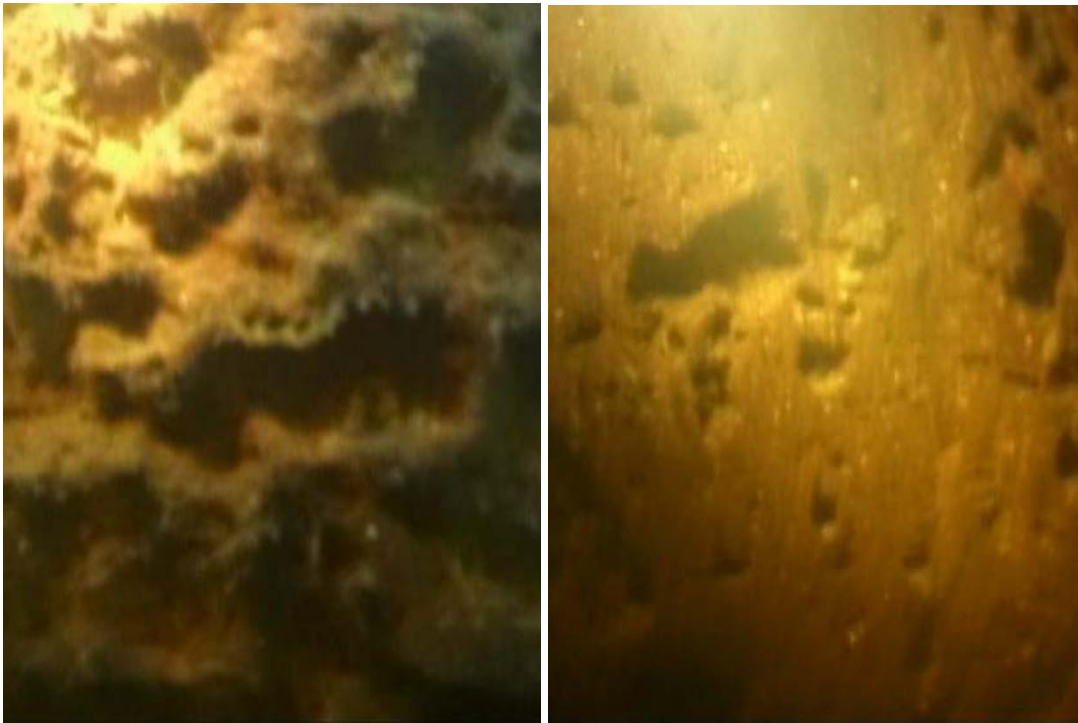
View of the pitted S72 Spillway Structure concrete abutment wall (left) showing ½' to 1" deep holes, and the weir/slab (right) showing lesser amount of pitting³⁸. After Malcolm Pirnie, February 9, 2007.
